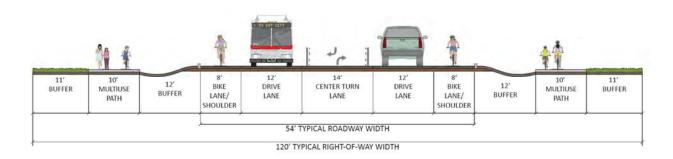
Existing Mendenhall Loop Road Cross Section: Vicinity of Back Loop
